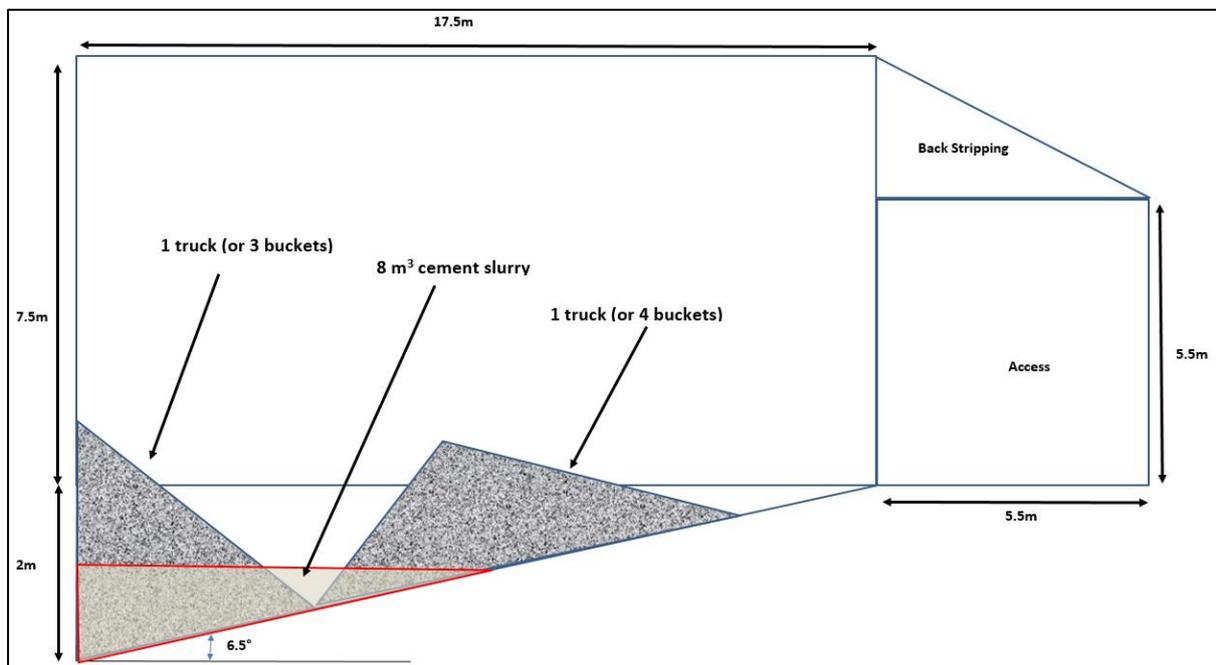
Long-section schematic of stockpile mixing cuddy (not to scale)
